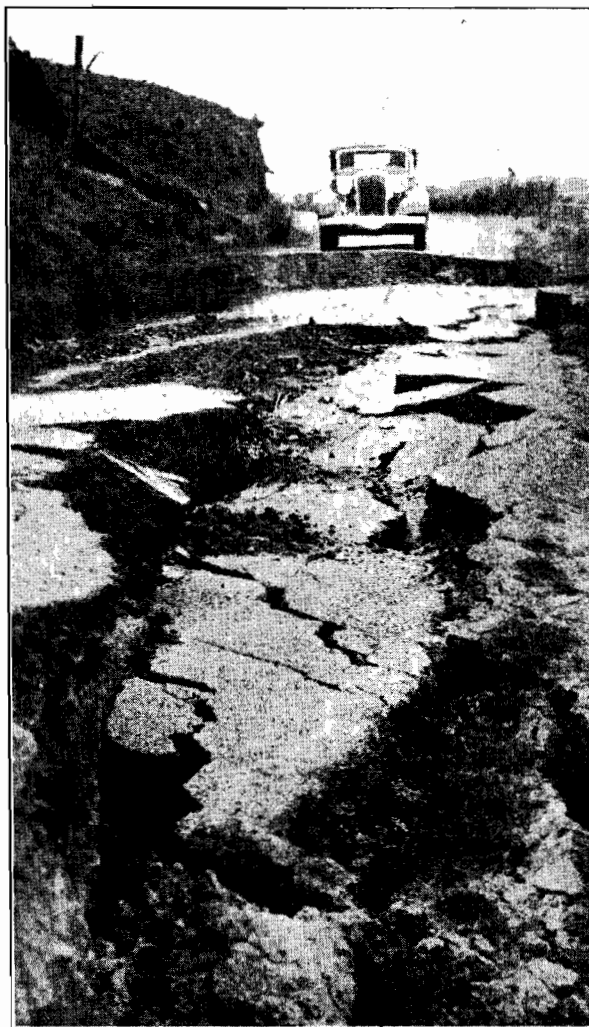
Showing landslide on the Allambée-Childers Road caused by heavy rainfall.
